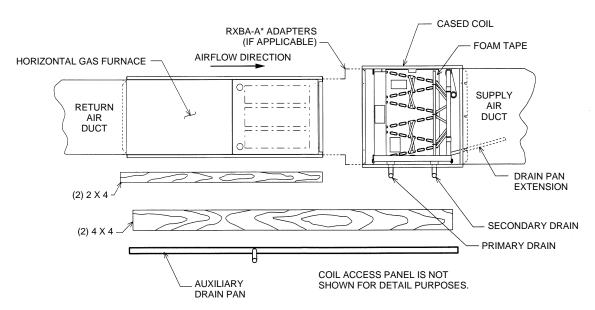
RIGHT-HAND AIR SUPPLY (FRONT CONNECTION COIL SHOWN)
